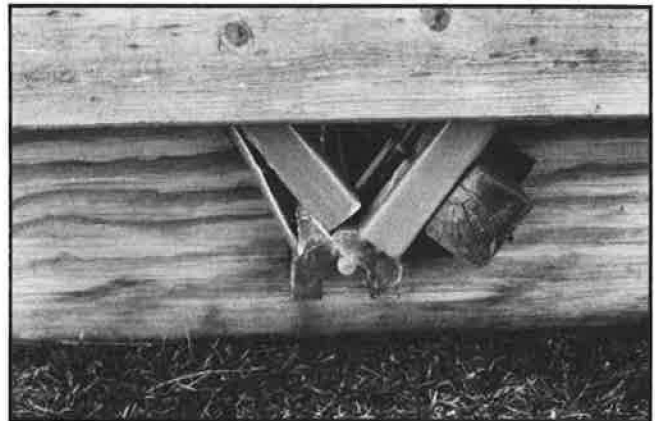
Damaged web stiffener at the end of the center girder.
